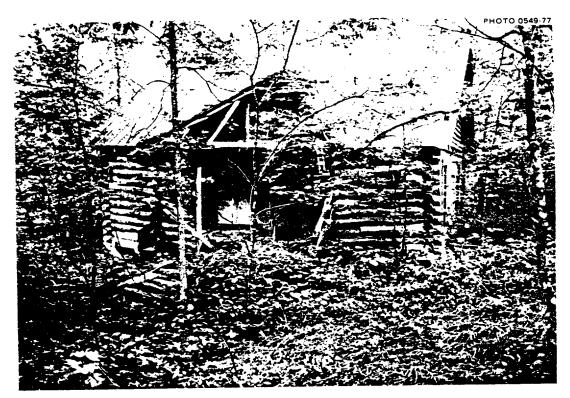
Rear Elevation of Structure 153A, Round Log Constructed House.
